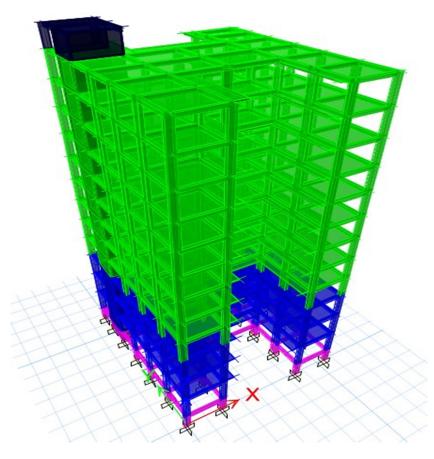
3D view of (G+12) storied commercial building for Plan 03
